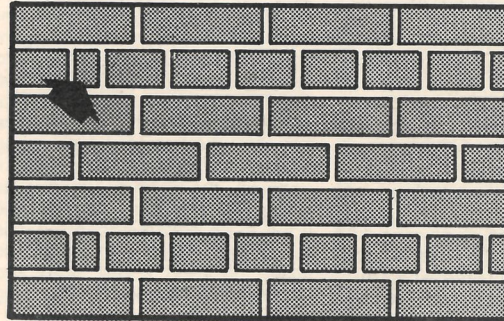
English garden wall bond — again, walls have to be 225mm thick. Although considered more decorative and less monotonous than English bond, this pattern is not so strong. Arrow denotes queen closers
